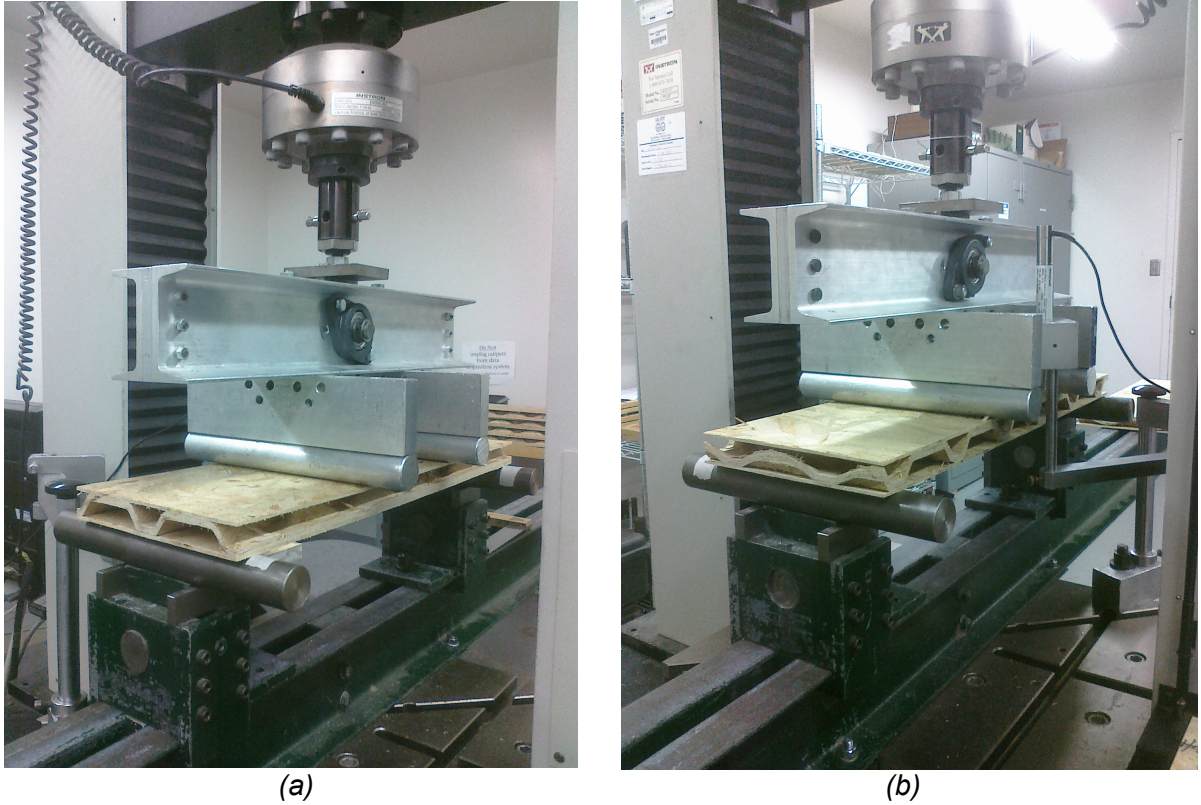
Beam flexure test apparatus. (a) Longitudinal specimen. Note two longitudinal ribs facing upward. (b) Transverse specimen with LVDT in place at mid-span.
